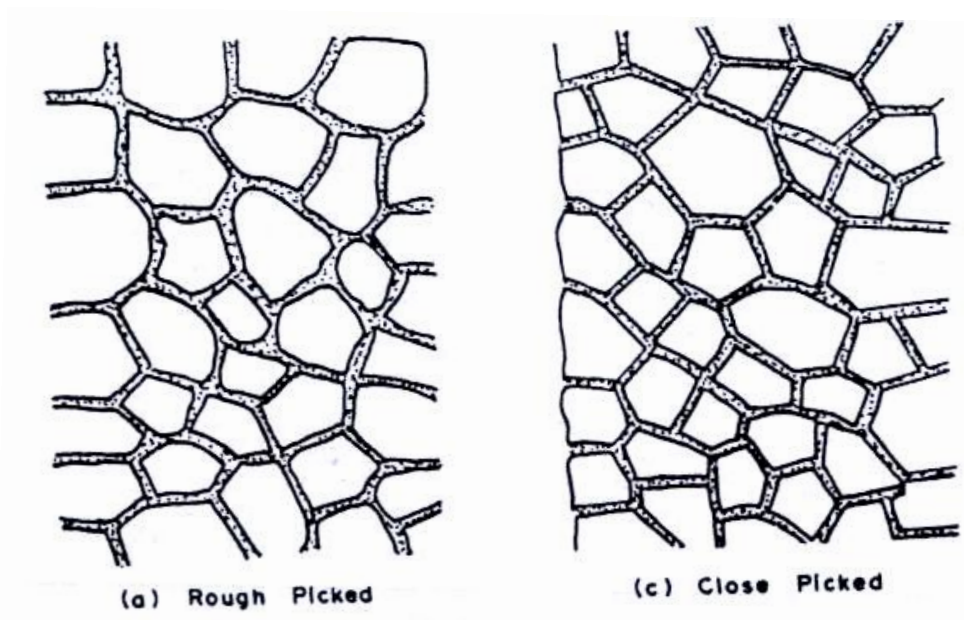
Polygonal walling: polygonal rubble masonry
